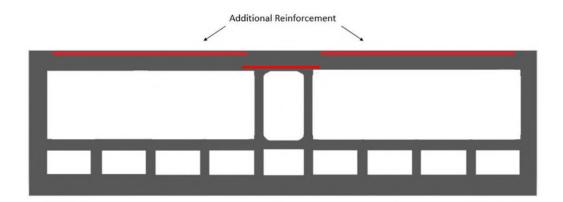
Additional reinforcement layout (Hanusaik, 2021)
